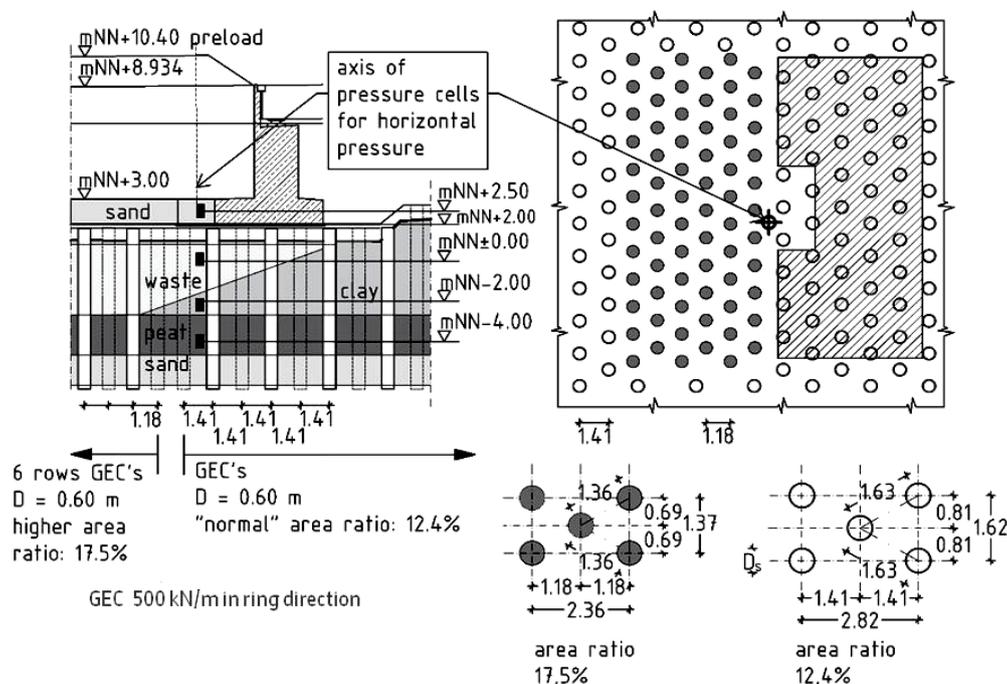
GEC foundation near the abutment: longitudinal cross-section (left) and plan view (right); mNN=average sea level
